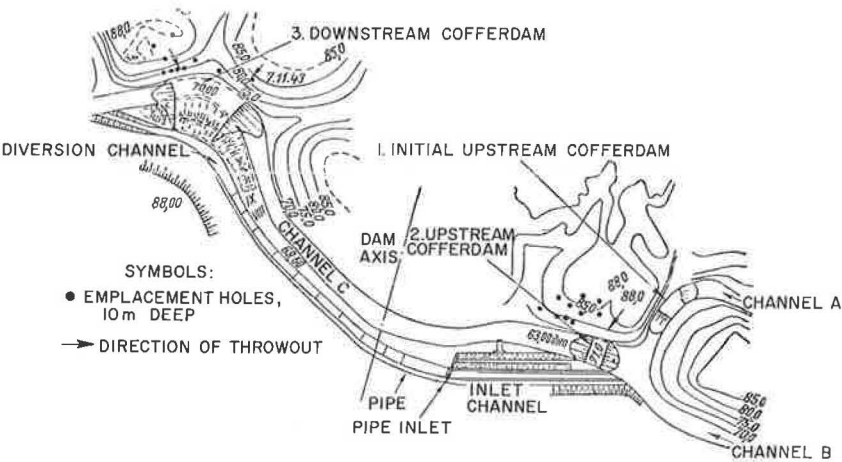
Project plan for construction of Government Electric Station No. 1 Dam; numbers indicating sequence of cofferdam construction by directed throwout; elevation contours in meters.
